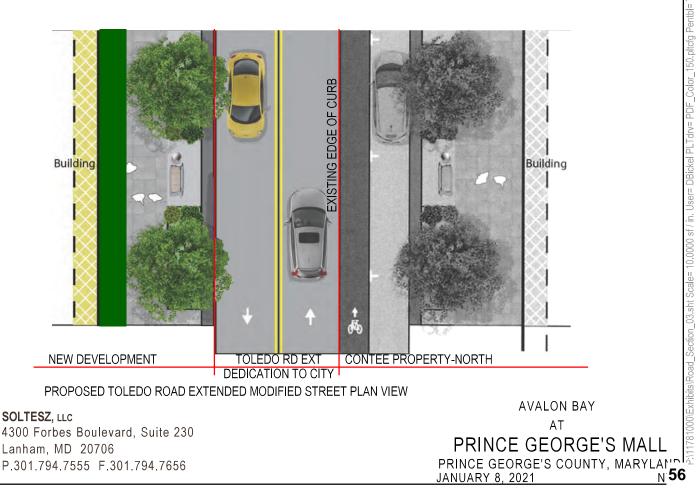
TOLEDO ROAD EXTENDED STREET SECTION
